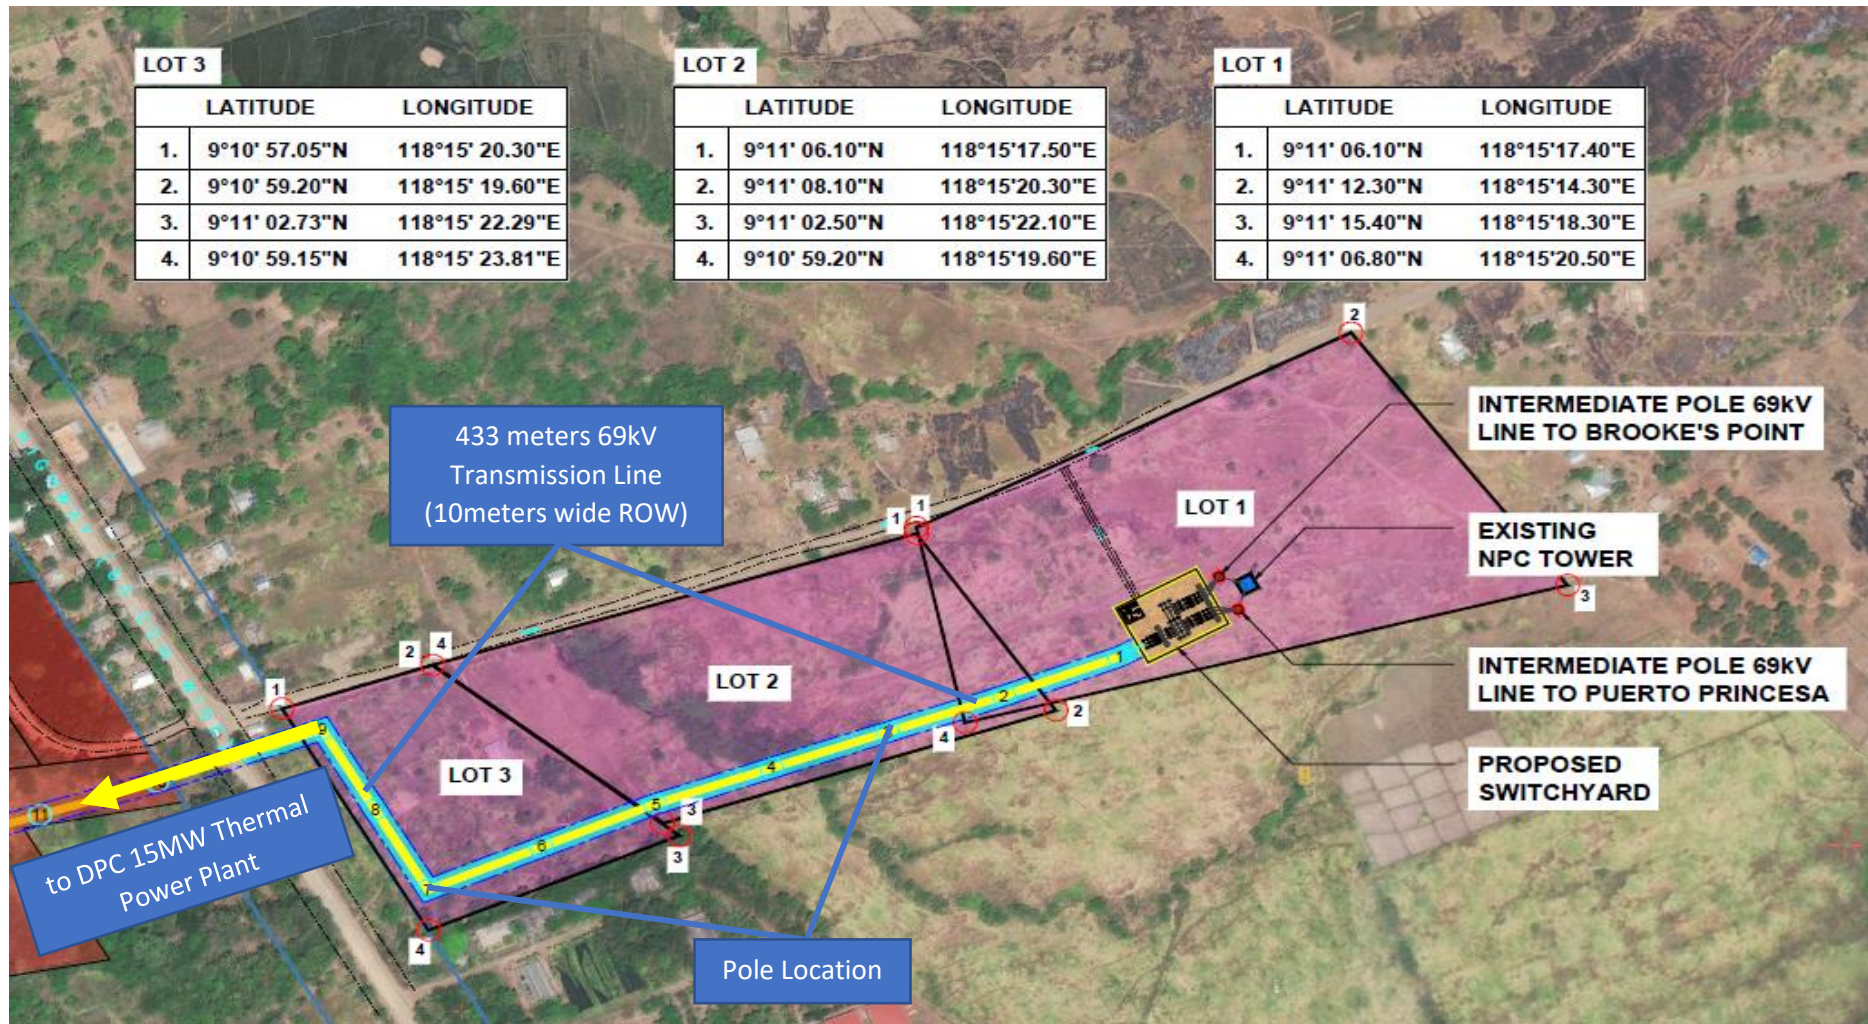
SITE DEVELOPMENT PLAN OF THE APPLIED AREA
